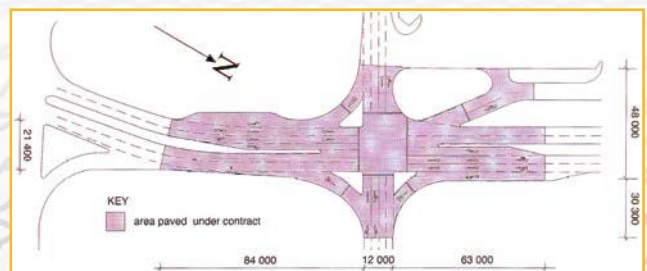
Plan-view of intersection showing junction with adjacent asphalt roads.
